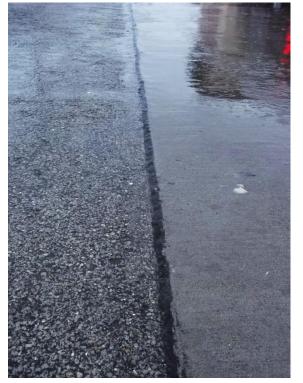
Pervmeable pavement (left) staying relatively drier during a rain event next to sheeting water on regular pavement.
